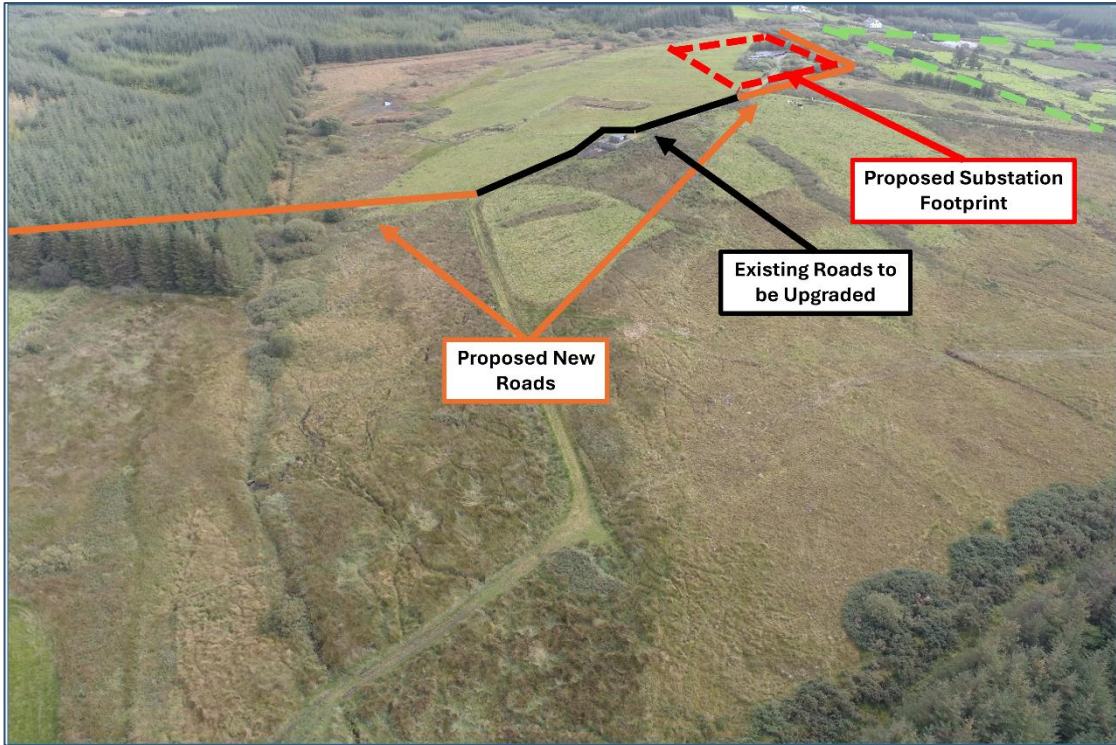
Aerial Image from above the Proposed Wind Farm site facing East, Illustrating the Proposed Substation Location Existing Roads and Proposed New Roads in the east of the Proposed Wind Farm site
